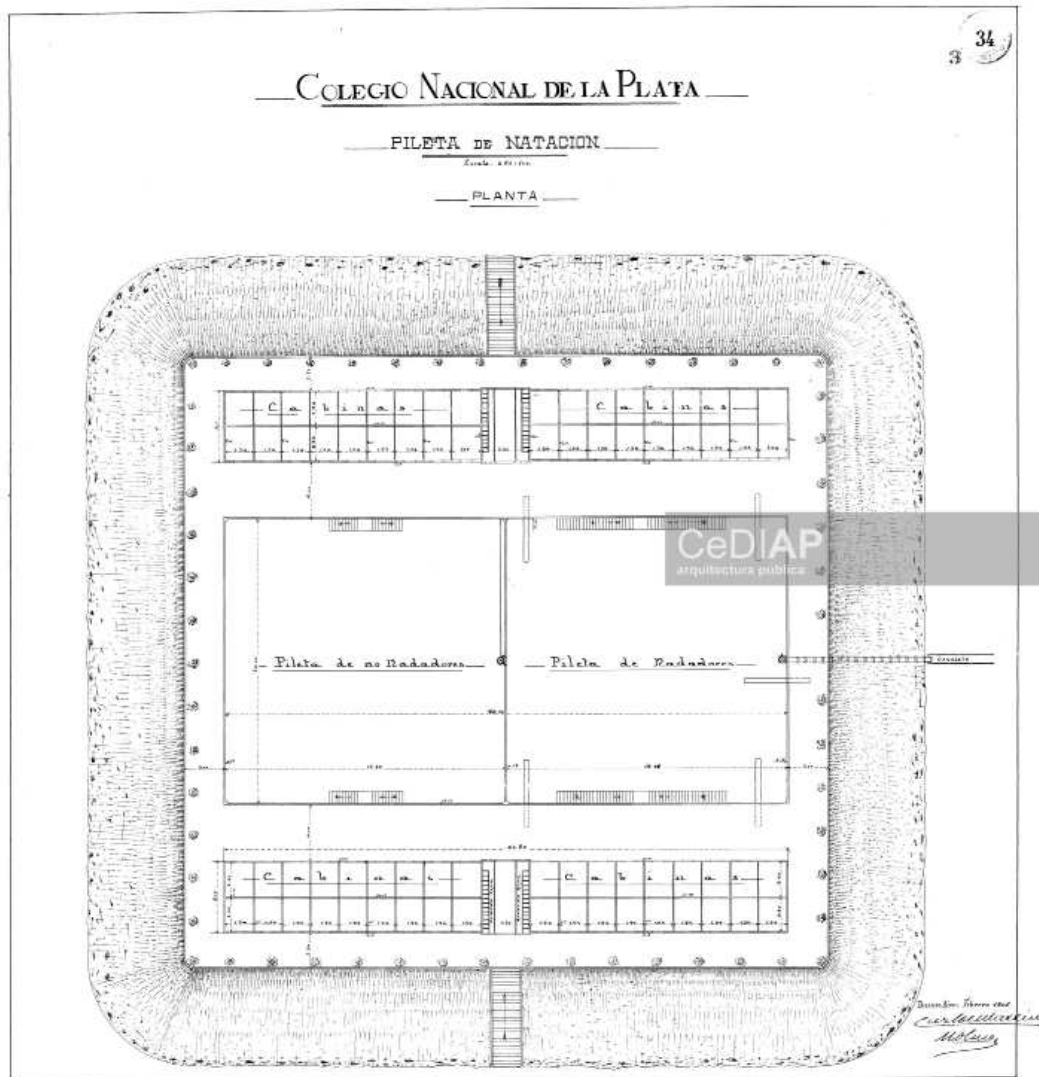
Swimming Pool. Floor plan. Archive of the Public Architecture Documentation and Research Center –CeDIAP- of the Ministry of Economy and Public Finance.
